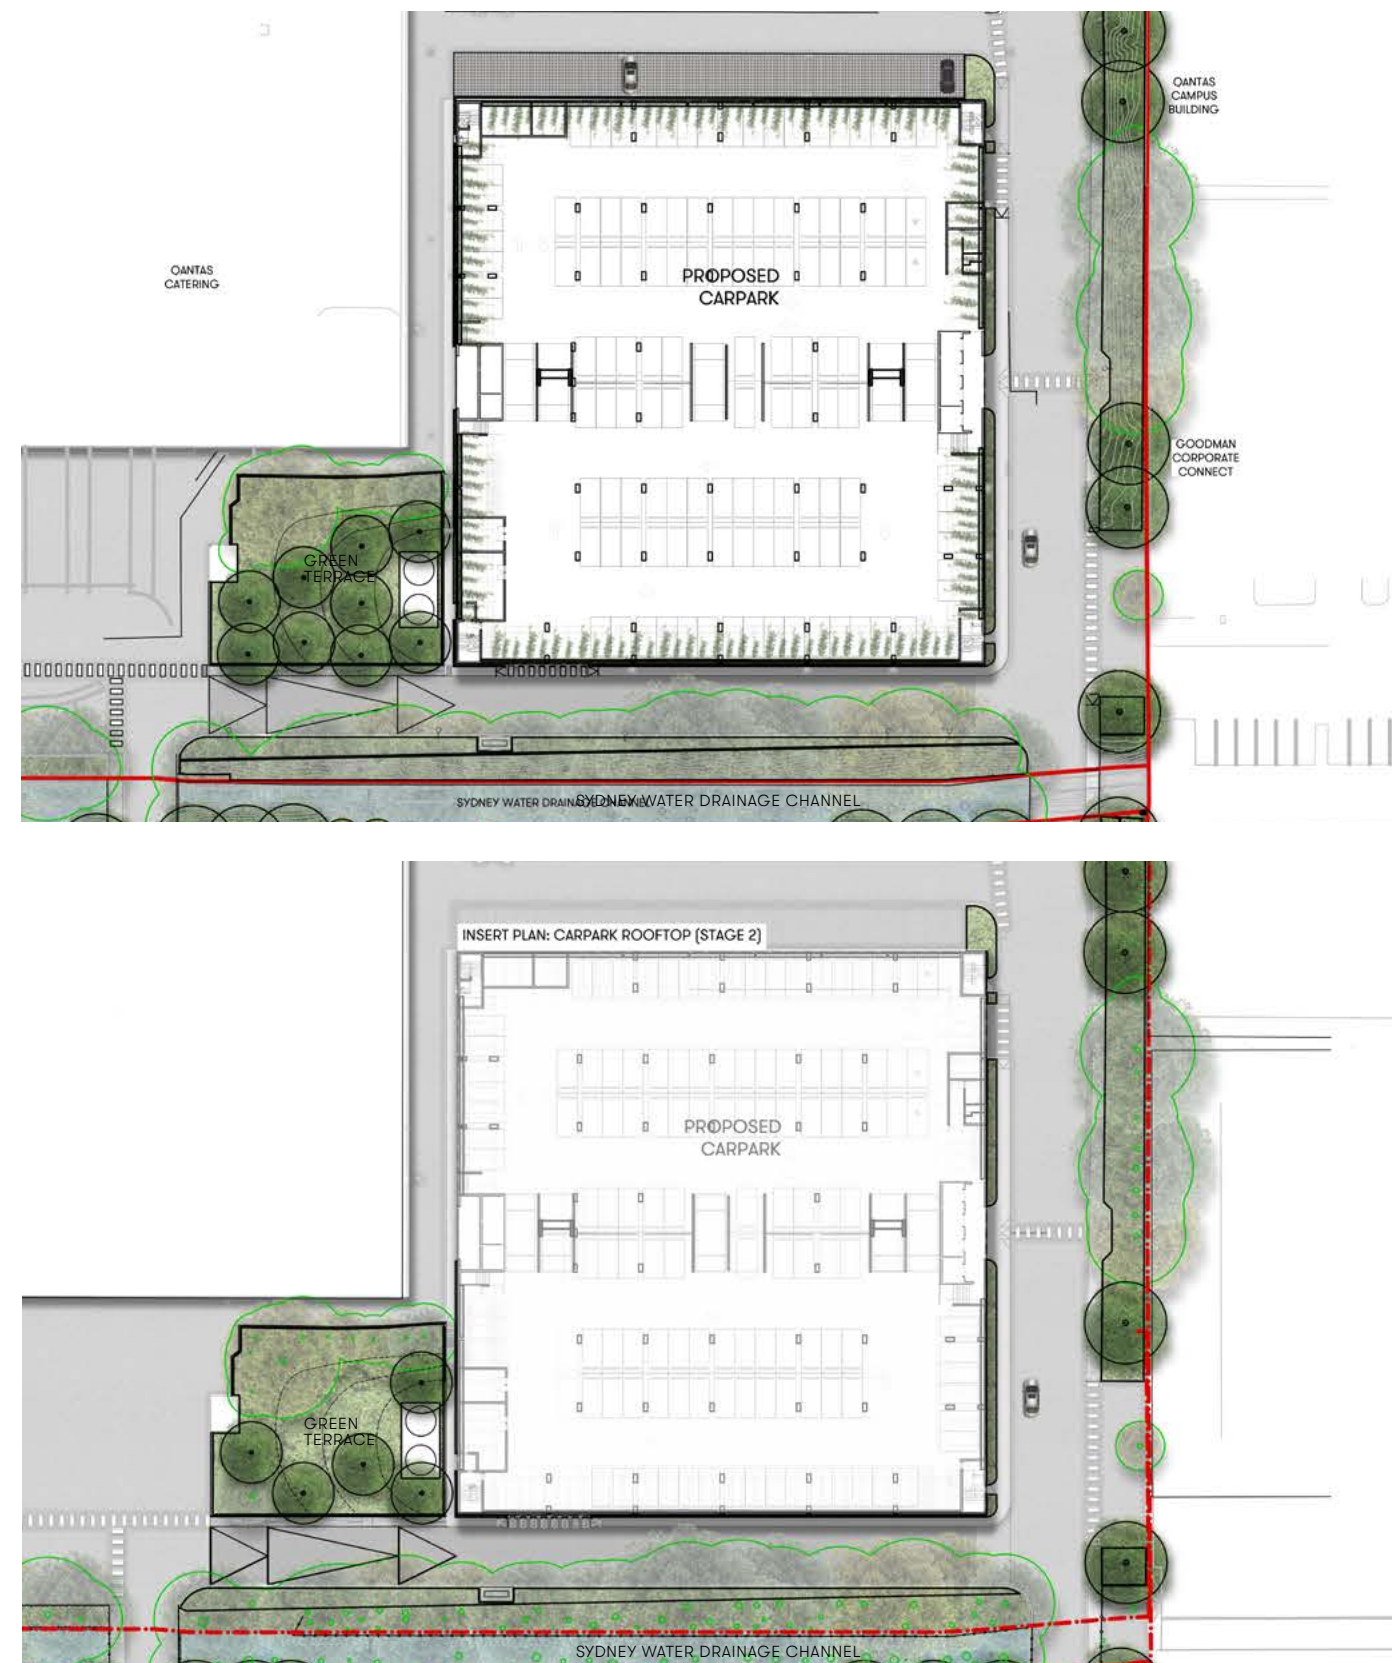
Proposed Multi Level Carpark Ground & Roof Plans
